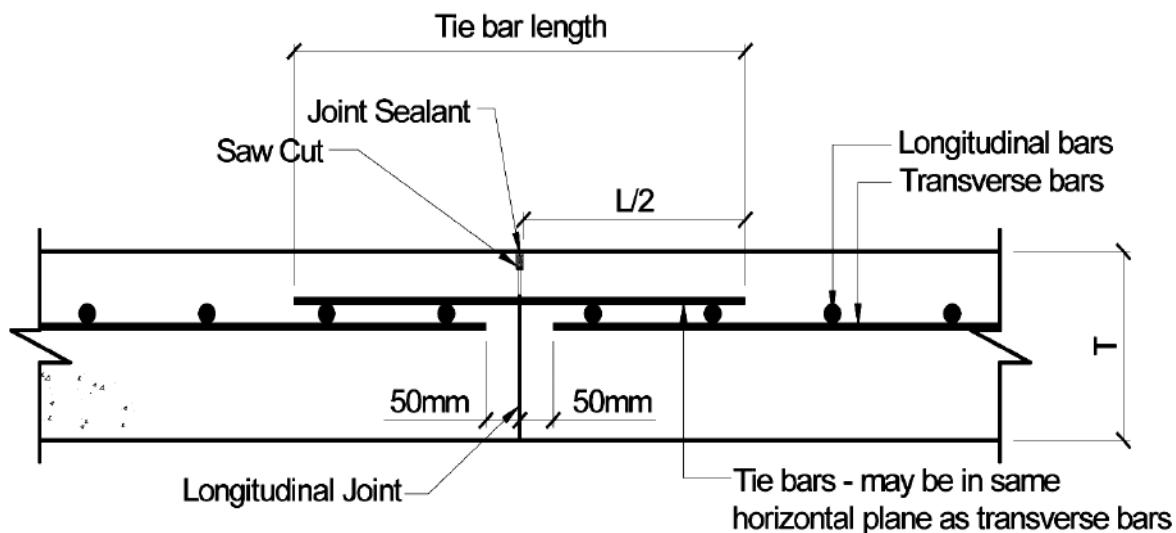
Longitudinal Construction Joint with Multiple Piece Tie Bars
